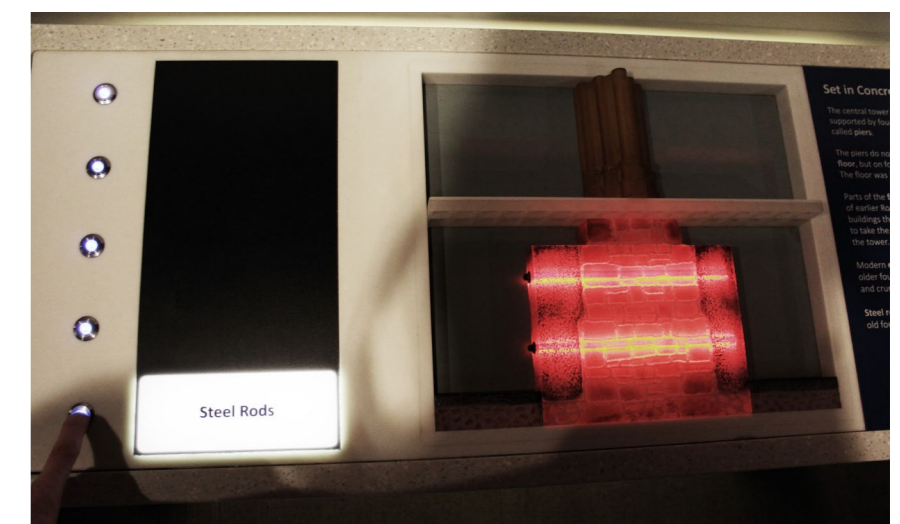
Interactive exhibit indicating steel rods reinforcing the concrete collar, Author's own
